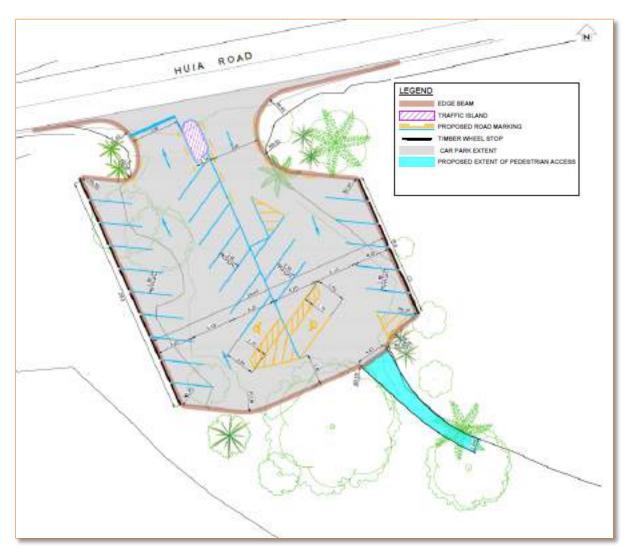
Proposed car park plan. (Source: Stantec Design Drawing Set)
